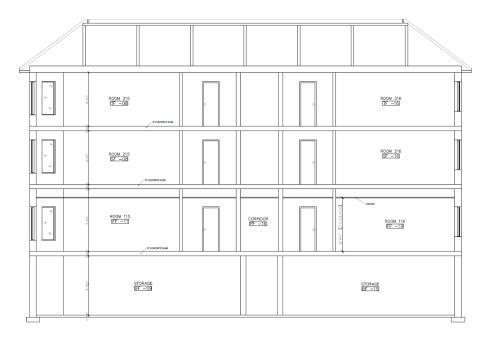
Cross section - South façade (Benan Hanoudi Architect)
